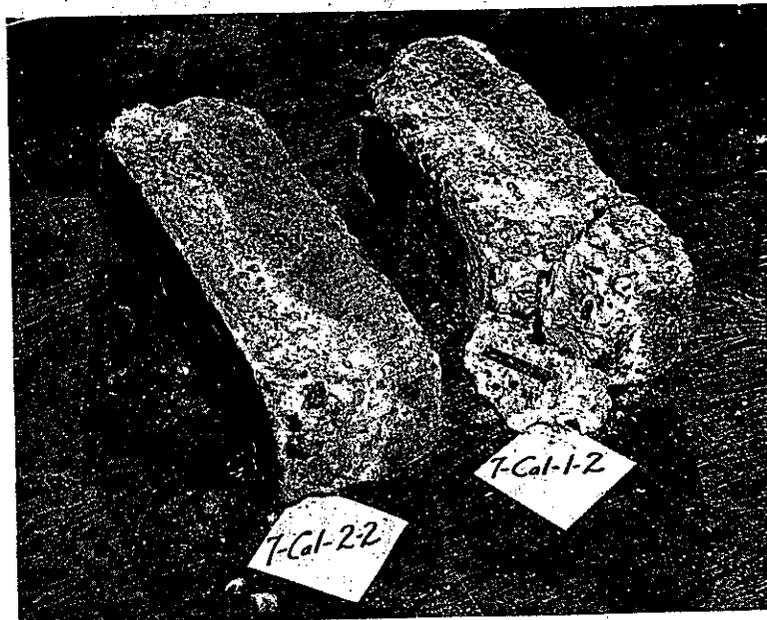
7-sack, Type II cement concrete beam after 42 months sulfate exposure. 7-sack shrinkage compensated cement beam was reduced to rubble and was removed from test at 42 months exposure.
